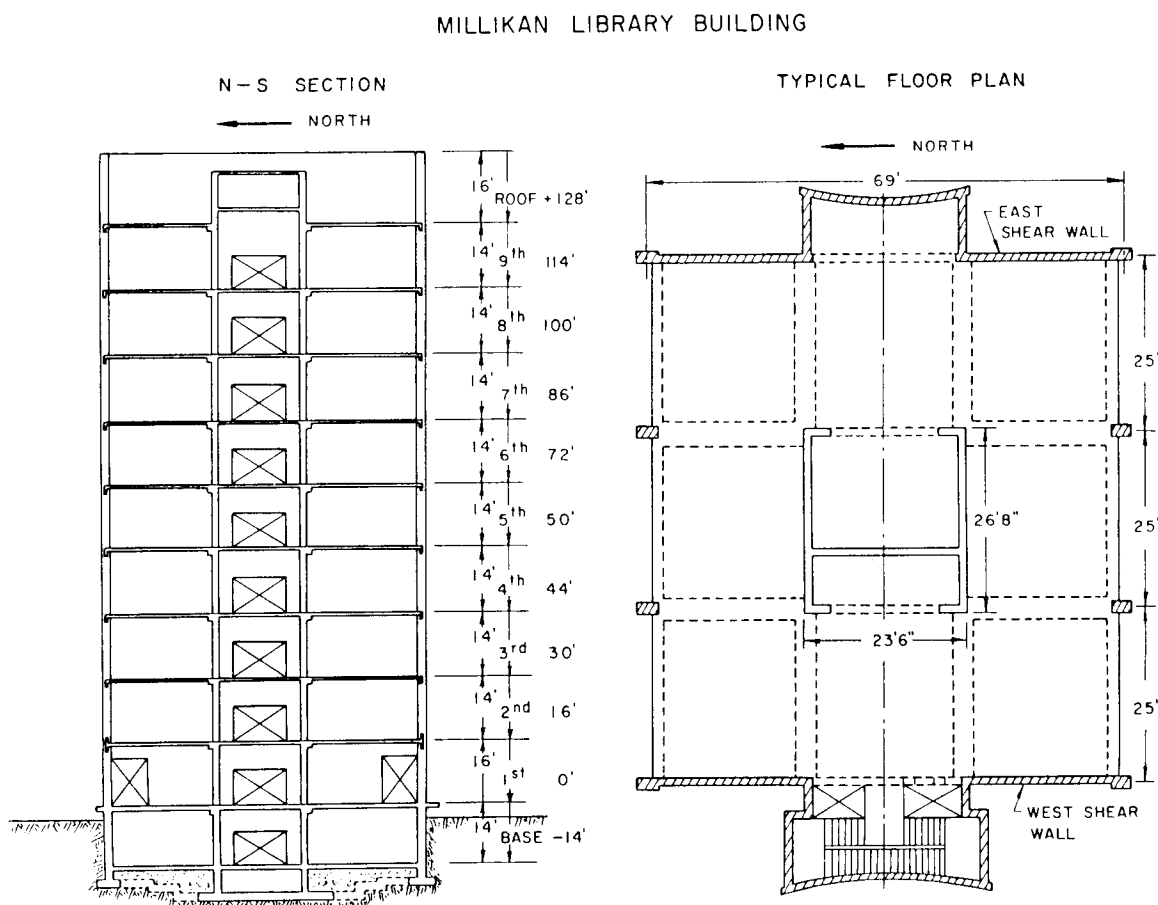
Millikan Library Building: N-S elevation and typical floor plan.
